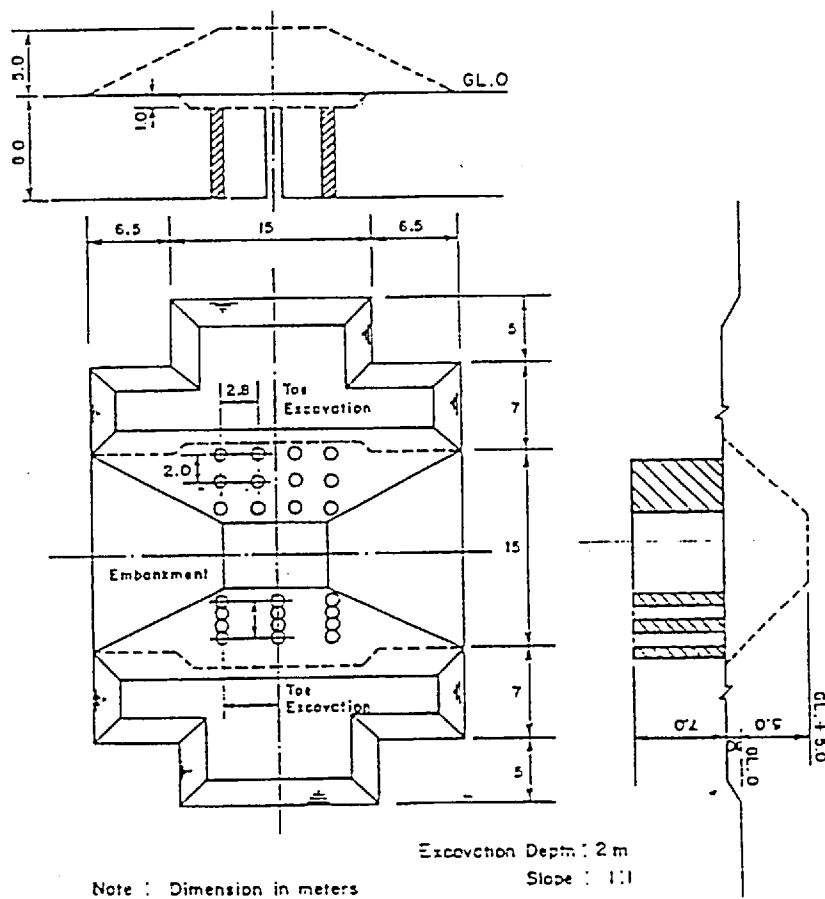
Plan and Section of the Test Embankment with Soil-Cement Piles
